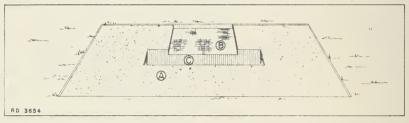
Method of flyproofing latrine pit with oiled burlap. A—
